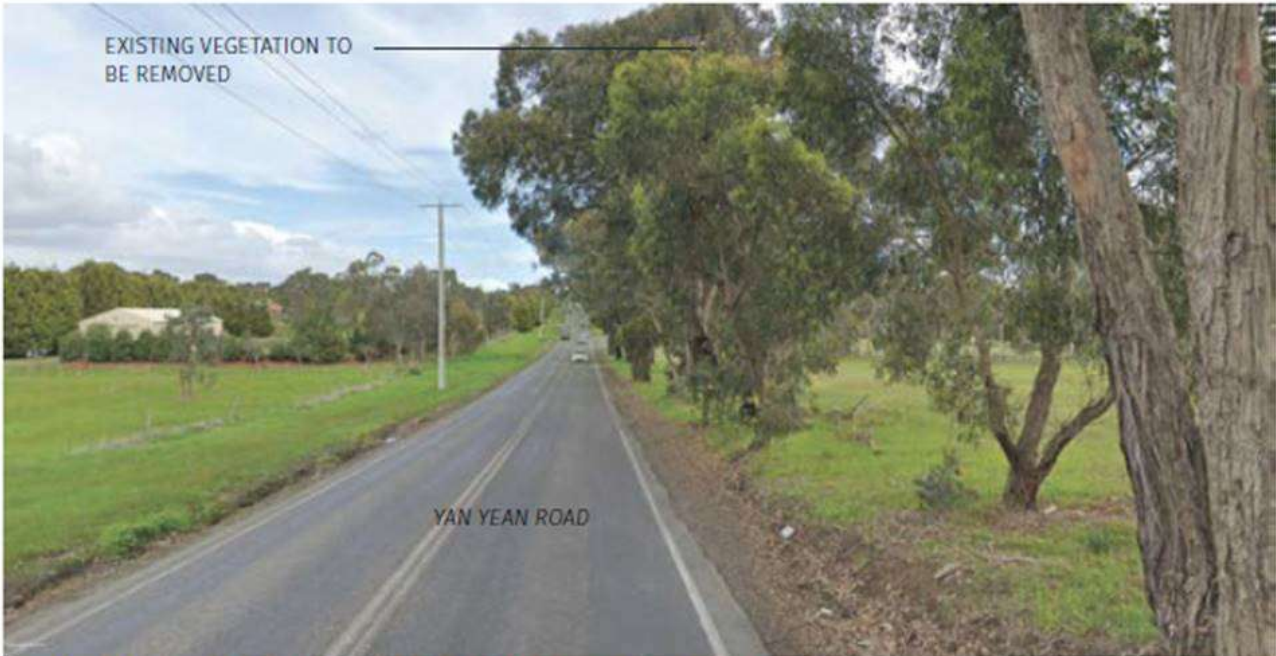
VIEWPOINT C - YAN YEAN ROAD ALONGSIDE YARRAMBAT GOLF COURSE, LOOKING SOUTH - EXISTING
